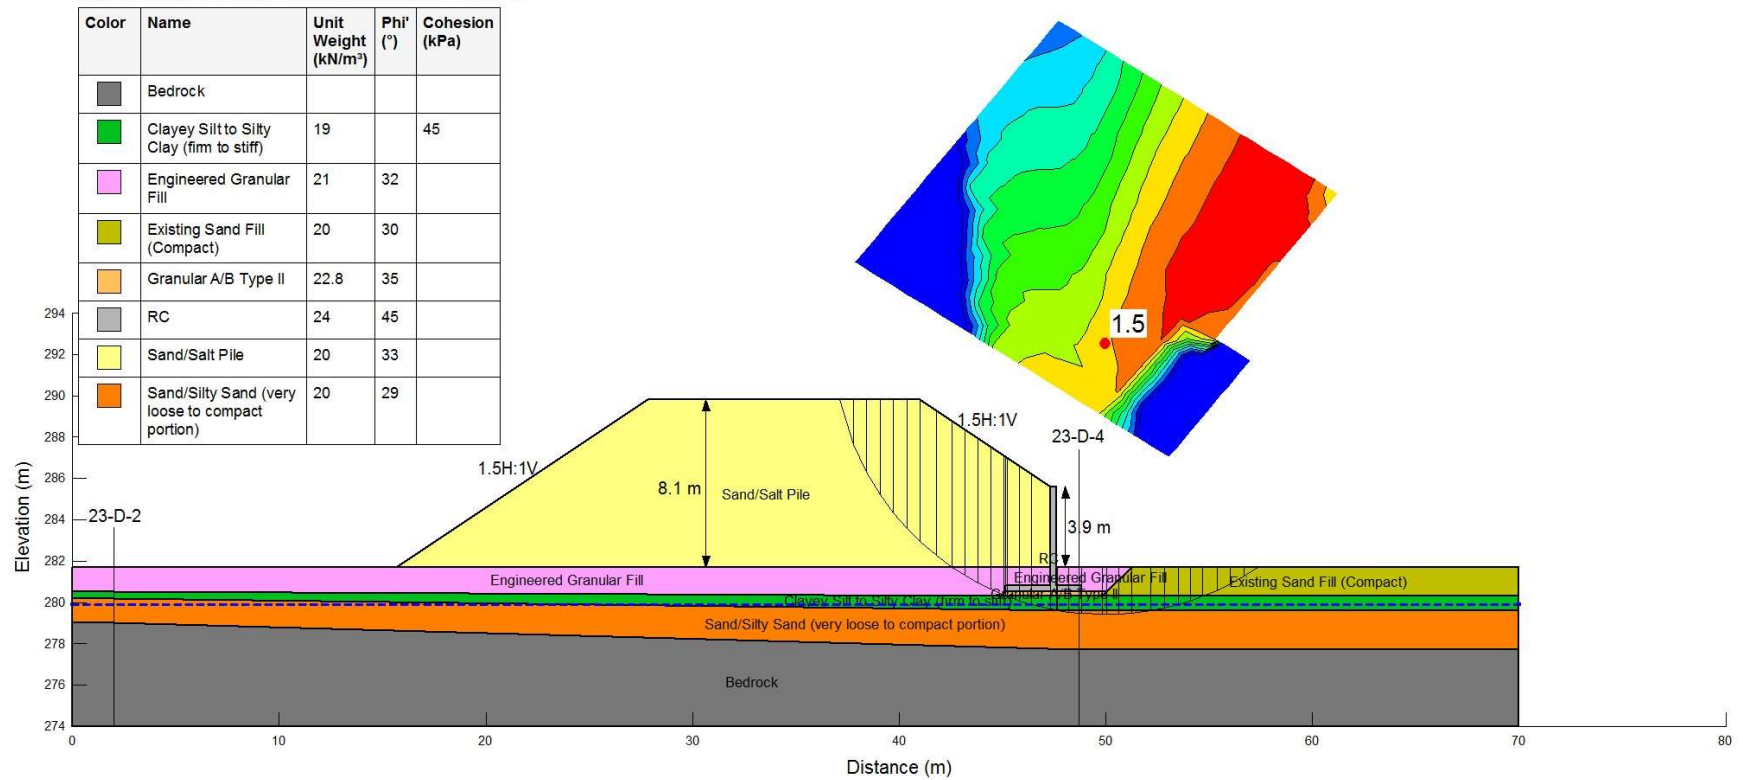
Slope stability analysis of new material storage building – N-S section, north side wall – undrained static analysis
